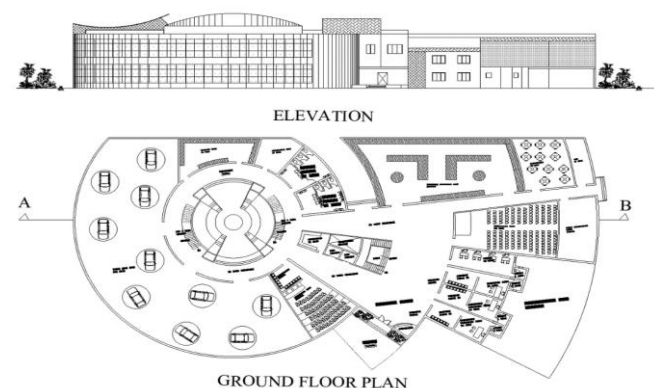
Elevation and Ground Floor Plan of Arusha Cultural Heritage Centre Tanzania, showing the Curvilinear Concept.
